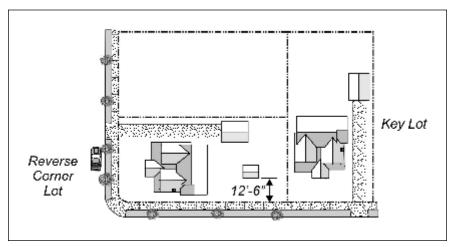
Accessory Structure on Reverse Corner Lot
